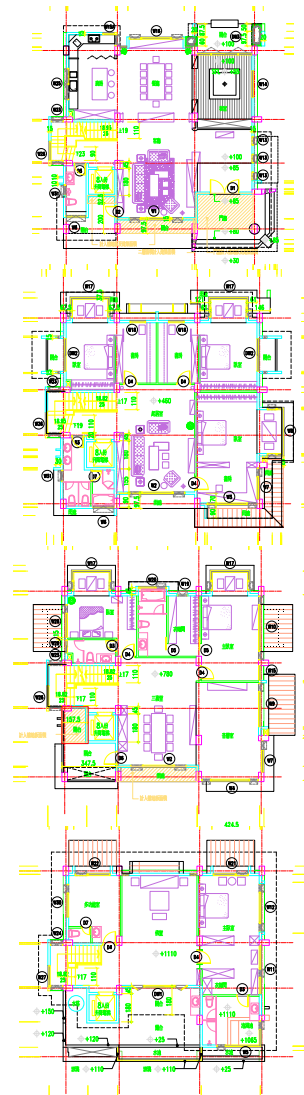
The plan of AutoCAD (from top to bottom: 1F, 2F, 3F, 4F)
